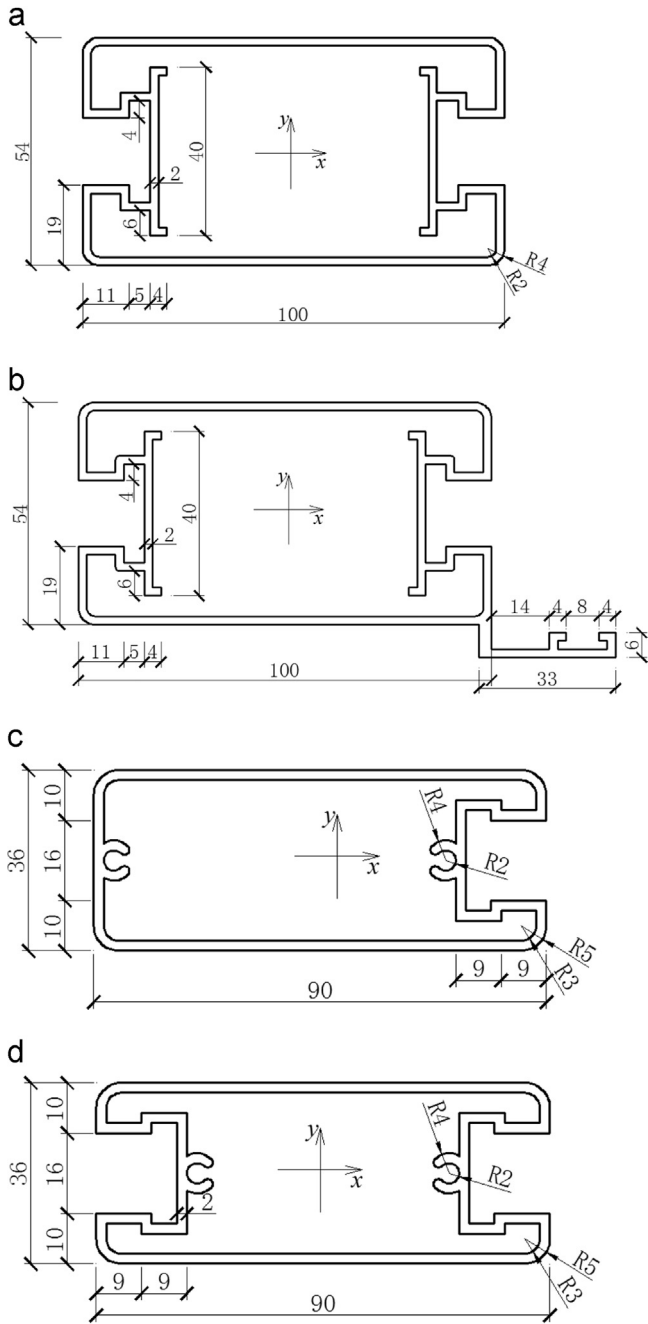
Cross section of the test members. (a) Section A, (b) Section B, (c) Section C, and (d) Section D.
